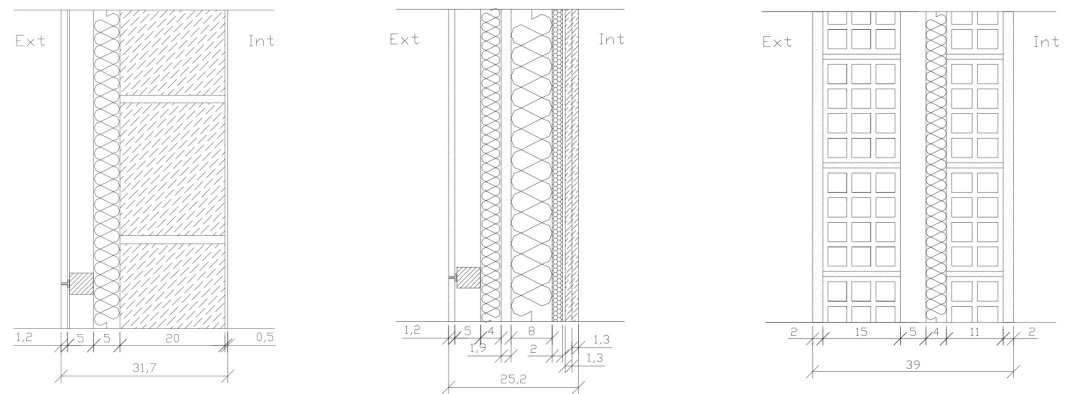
a) Mixed-weight double leaf wall PMD2.1/15 – wood/cement board, air gap, cork insulation, adobe; b) Triple lightweight wall PT(L)3.1 – wood/cement board, air gap, cork insulation, sandwich panel; c) Heavyweight double leaf wall PD1.2/15 – Hollow brick and XPS Insulation on the air-gap.
